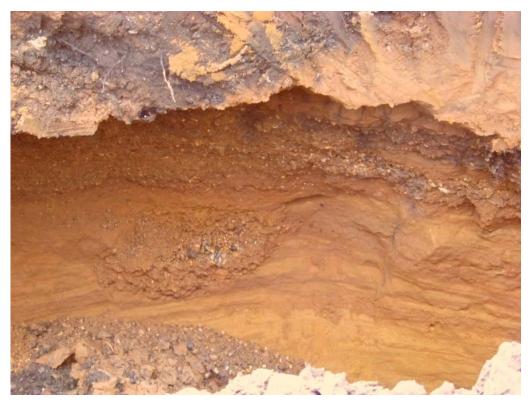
Trial Pit 2, Collapsed West Face (east facing)
